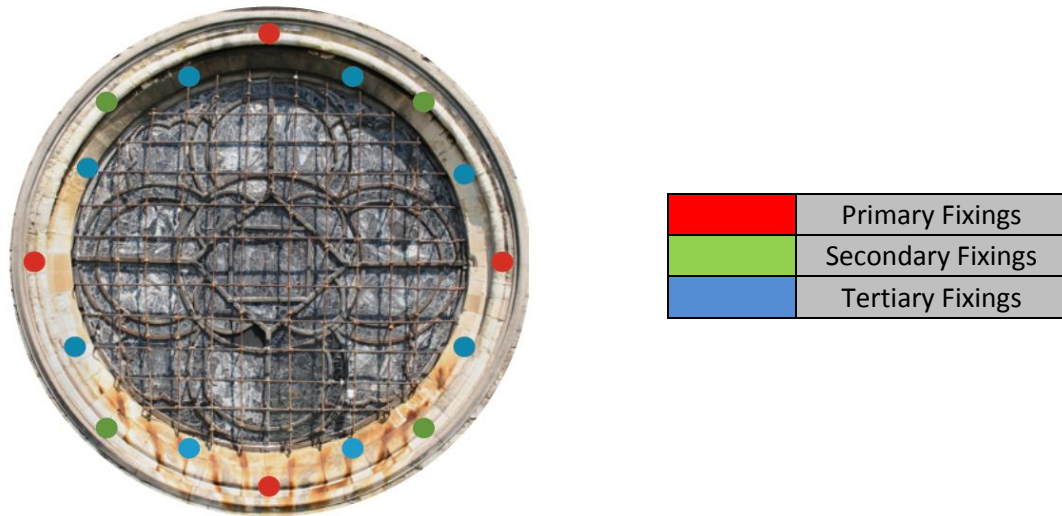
Anchor points of the Oculus into the masonry (Hall 2011)
